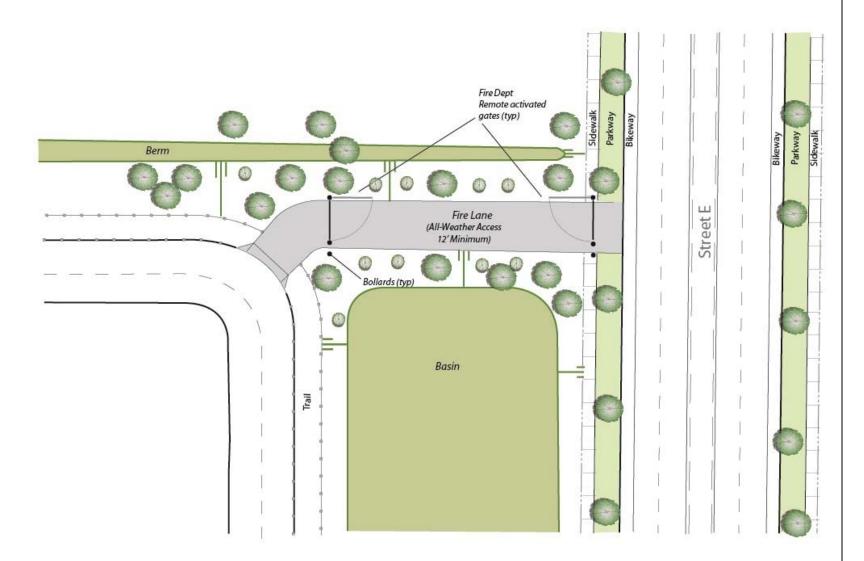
Multi-Use Trail Plan (pg.3-13)
